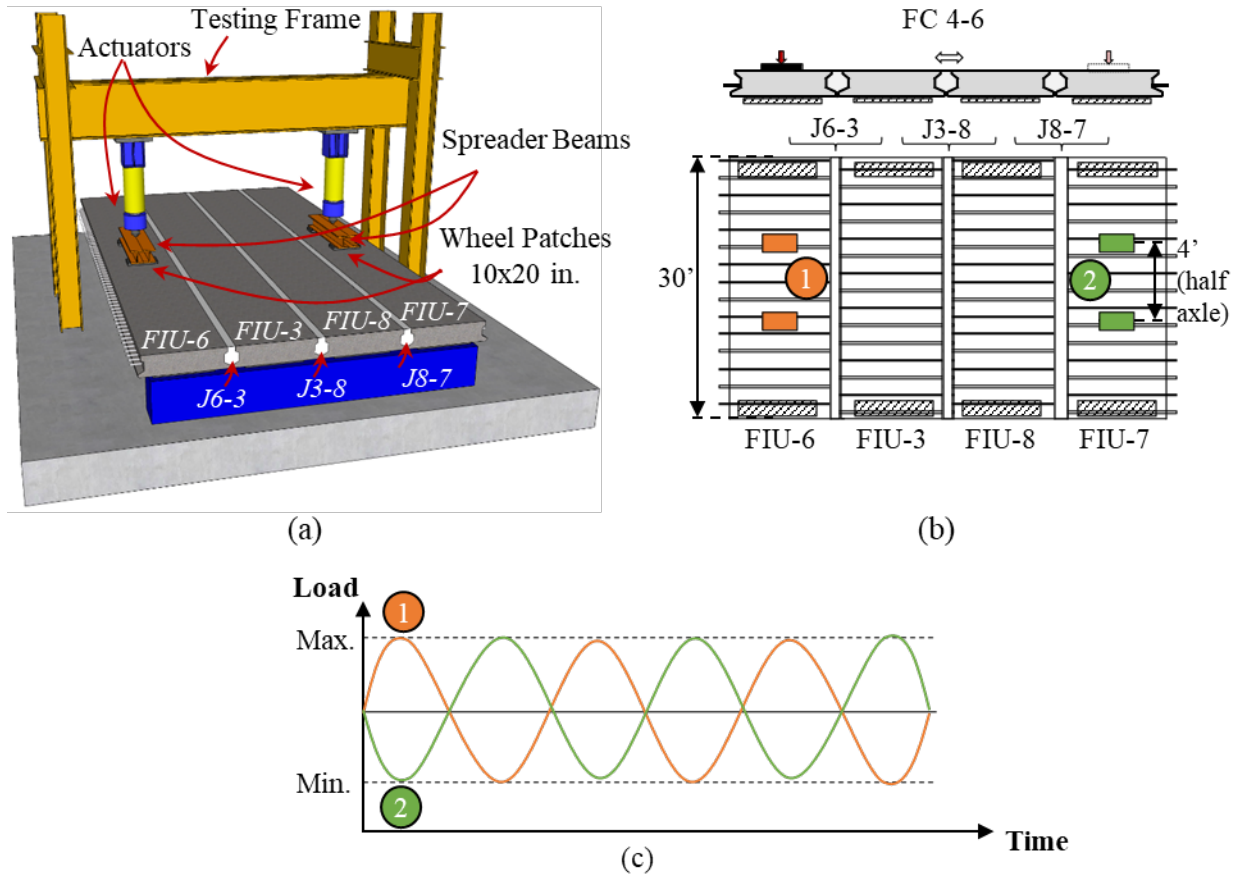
Test setup for Fatigue Configuration 4-6 (a) schematic, (b) plan and elevation view, and (c) reverse sinusoidal load protocol
